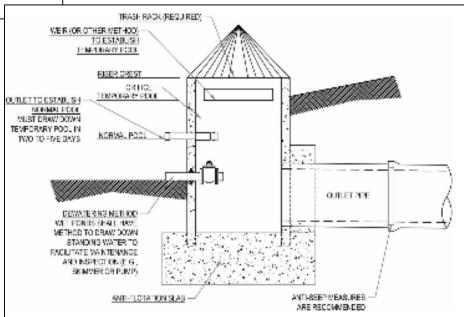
Basic Wet Pond Elements: Cross-Section View 2
